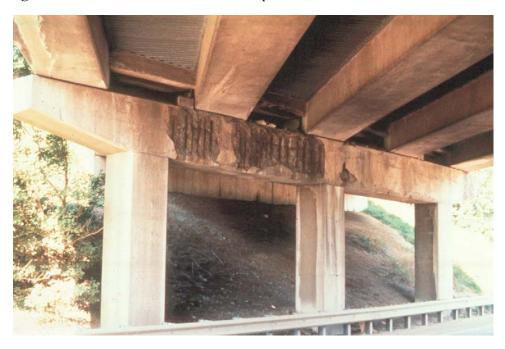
Severe Concrete Spalling on Bent Cap
